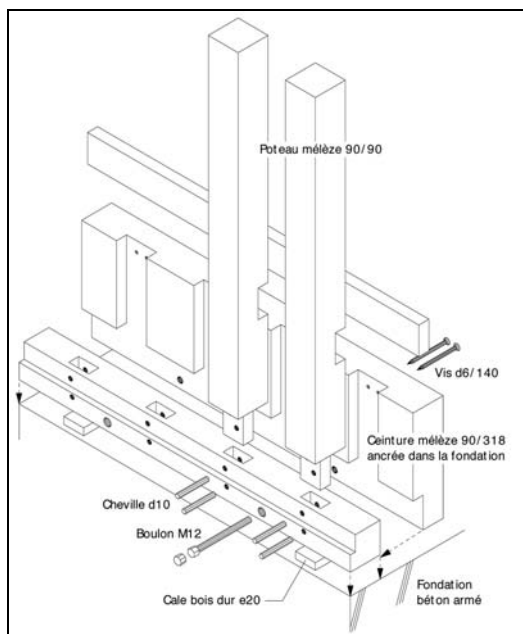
Joint detail of free standing columns, tea pavilion (source: Y. Amino [9]).
